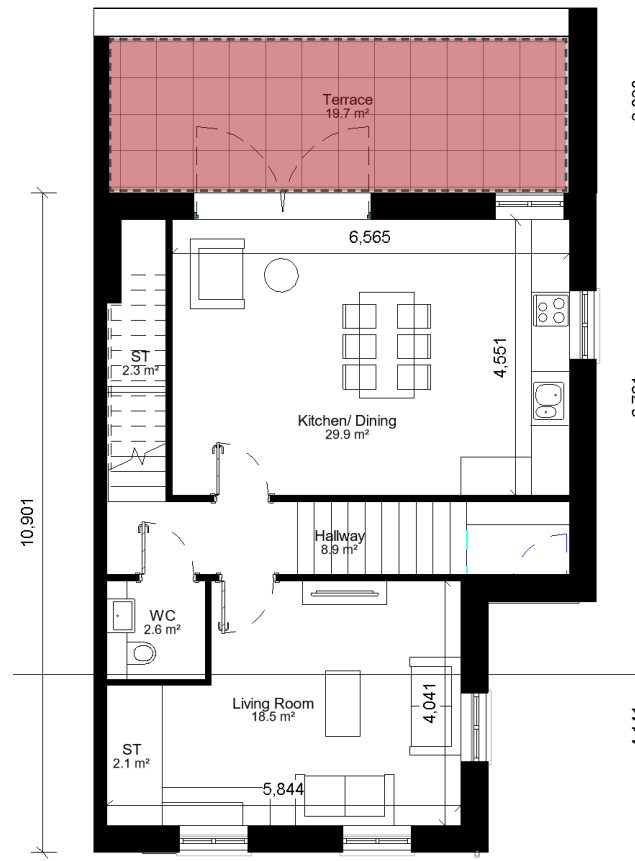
Proposed 3 Bedroom Apt Layout - First Floor Level - HT-05
